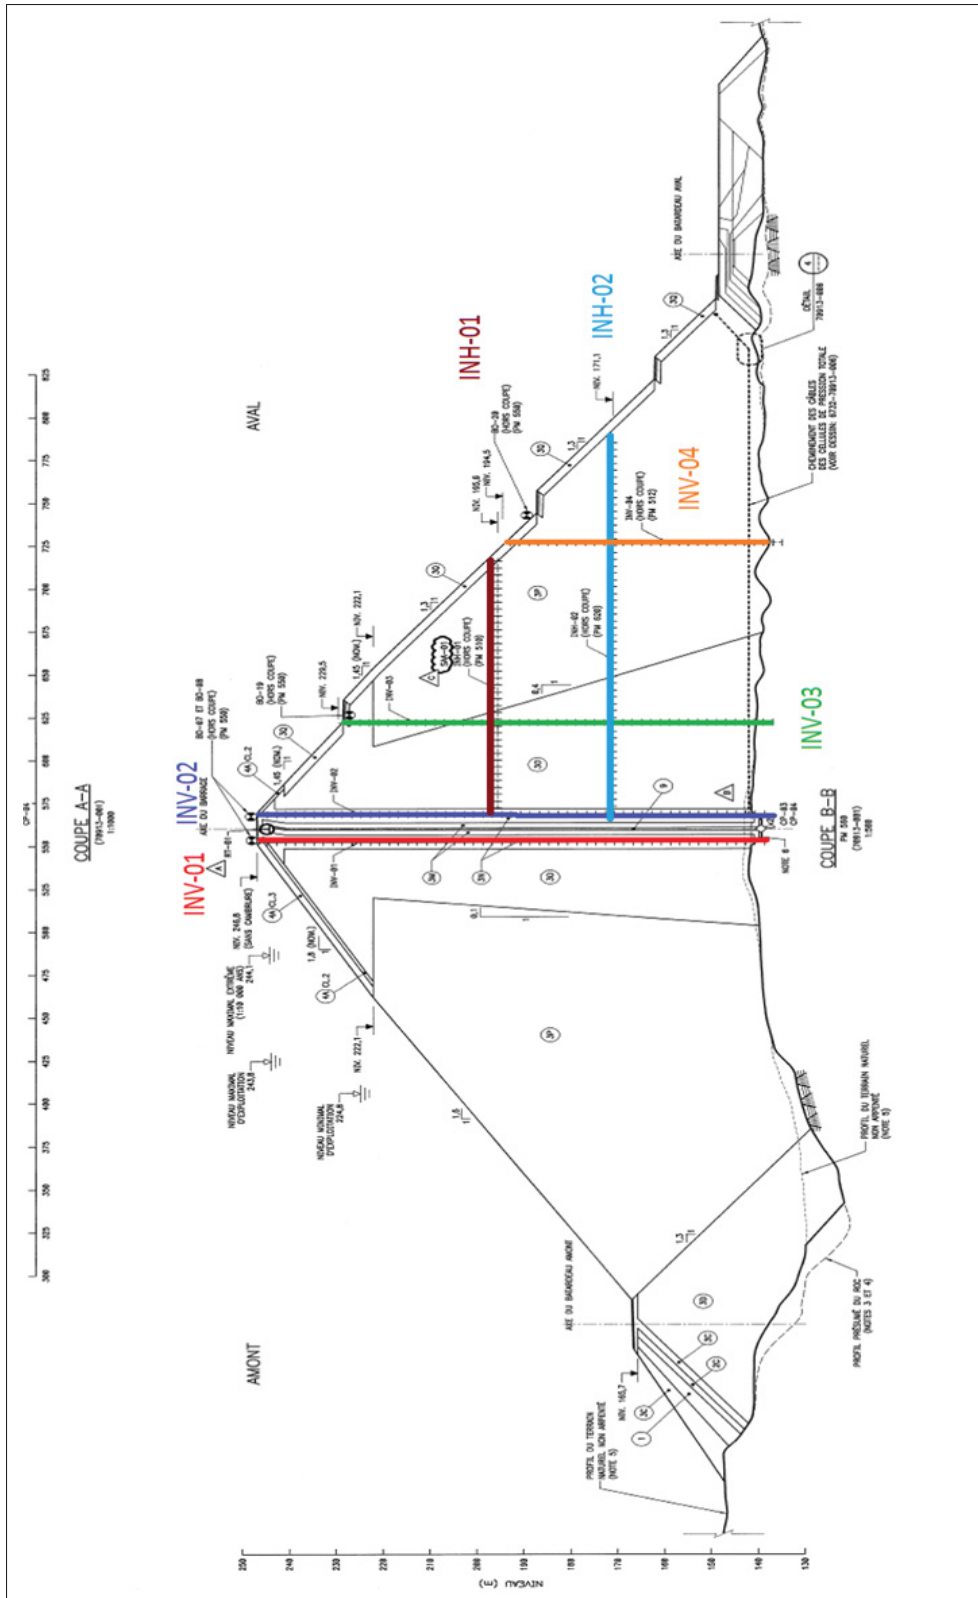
Cross section of Romaine-2 dam (cad drawing)
